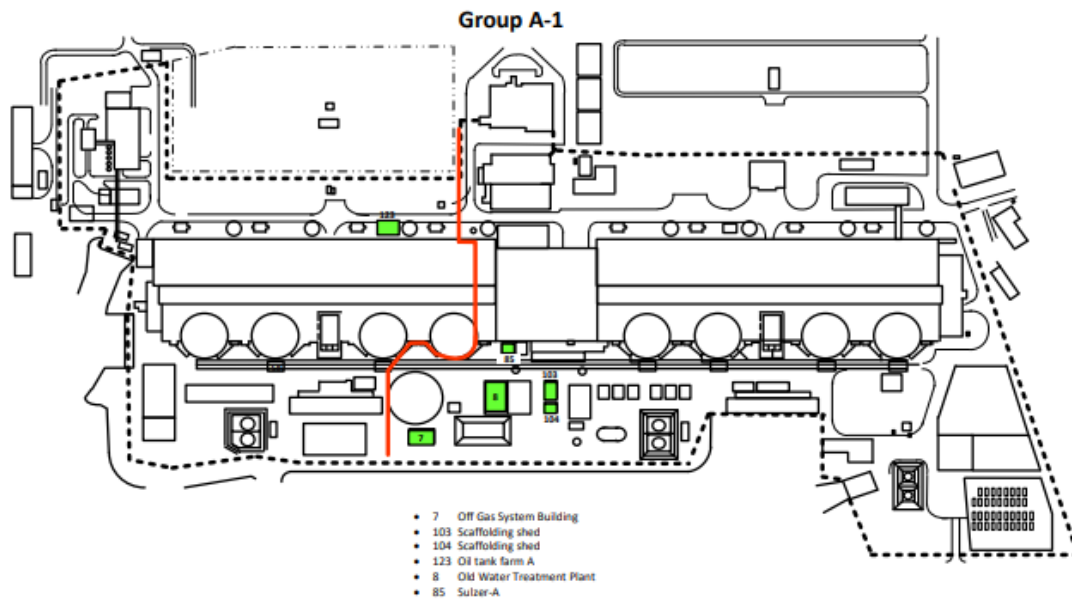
Planning Envelope A-1 – Outbuildings in Green
